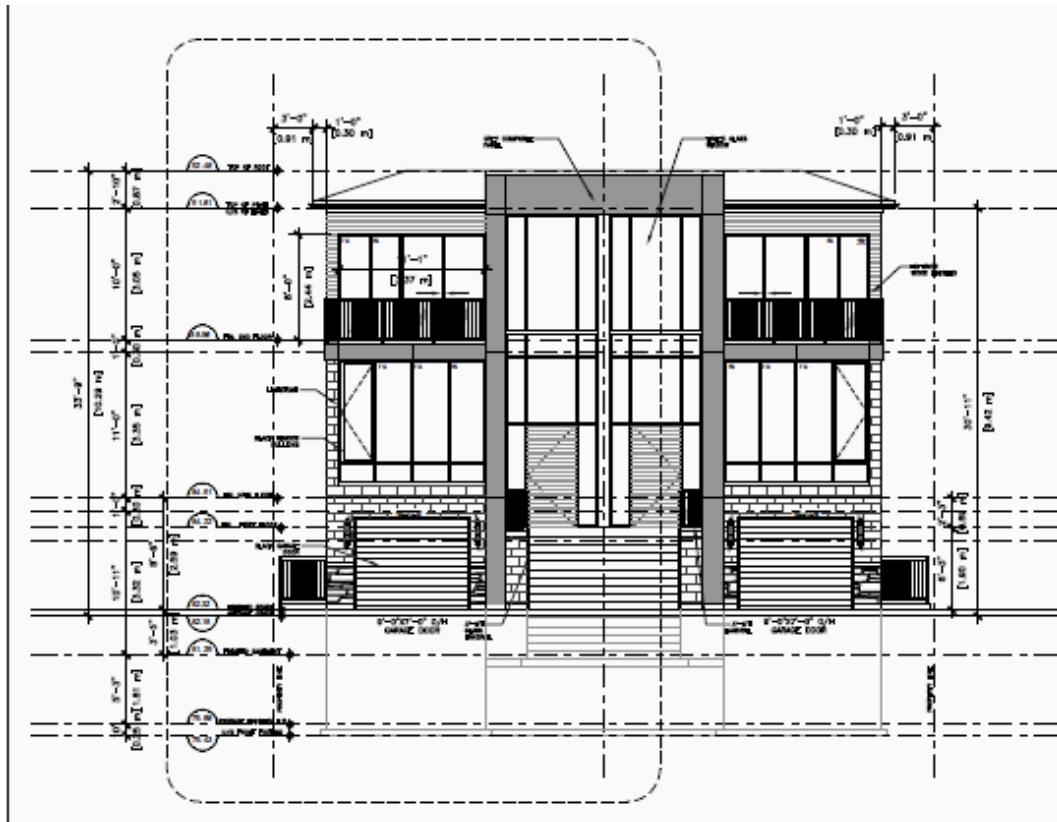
Front elevation of 10 Mississauga Road North. *(Image from owner.)
